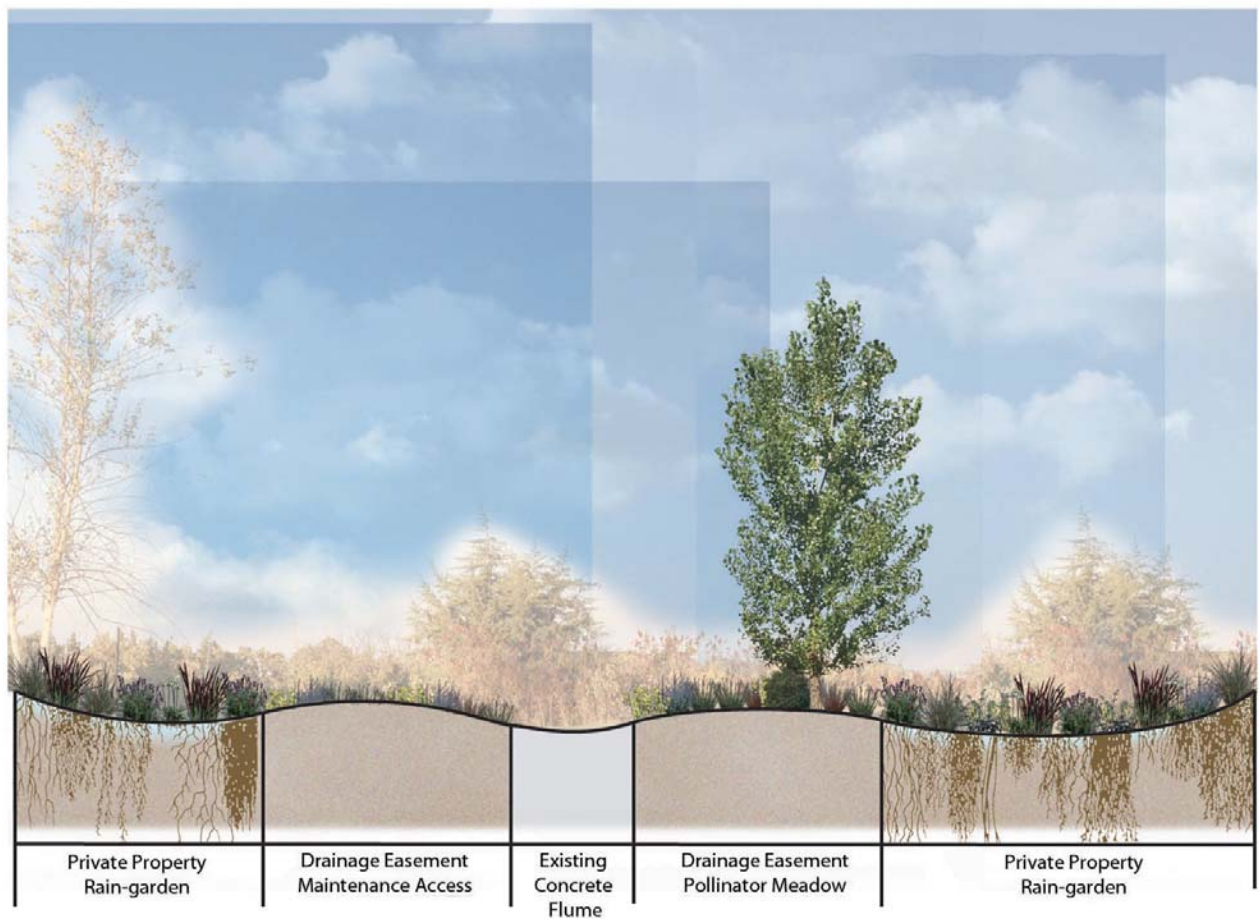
Section AA-Proposed Extensions of Conservation and Drainage Easements. By Author
